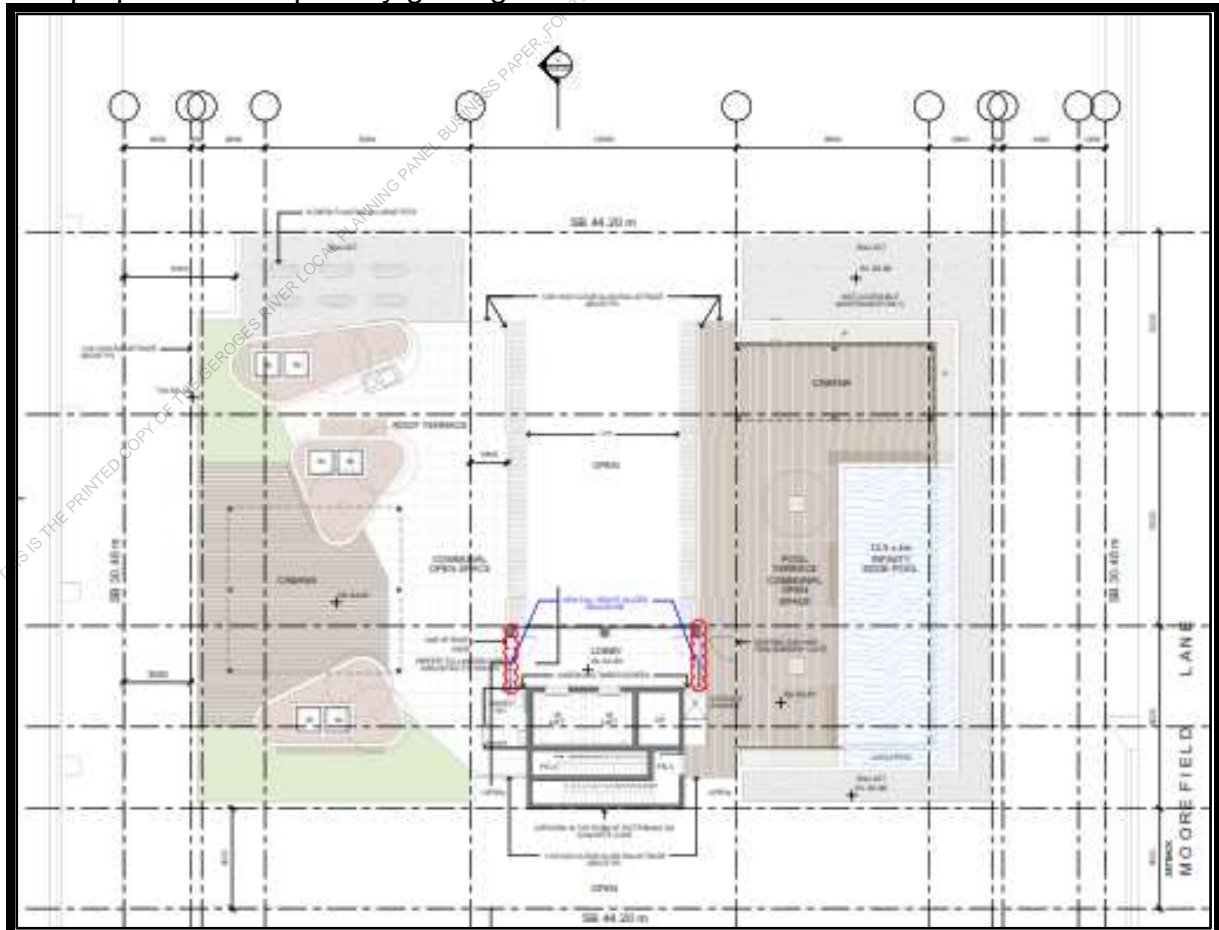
Proposed glazing clouded in red on the roof terrace plan (Source: Architectural Plans)
